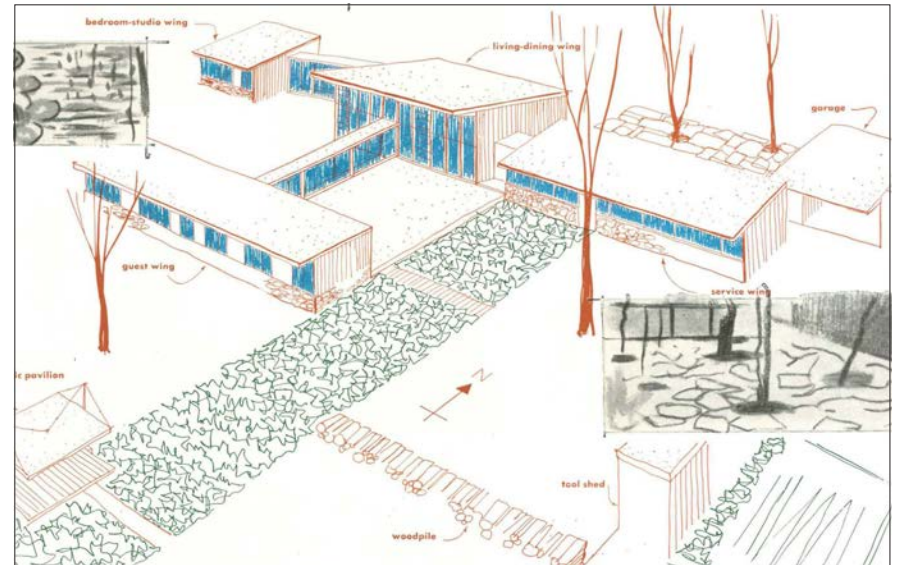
Floor plan of Girard House from House & Home, November 1952. Date: 1952. Photo credit: House & Home from <https://usmodernist.org/index-hh.htm>
